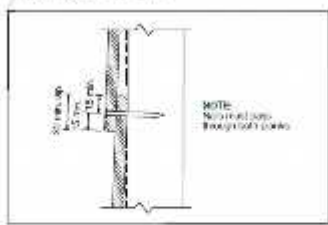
WALLING DETAIL FOR HARDBOARD
